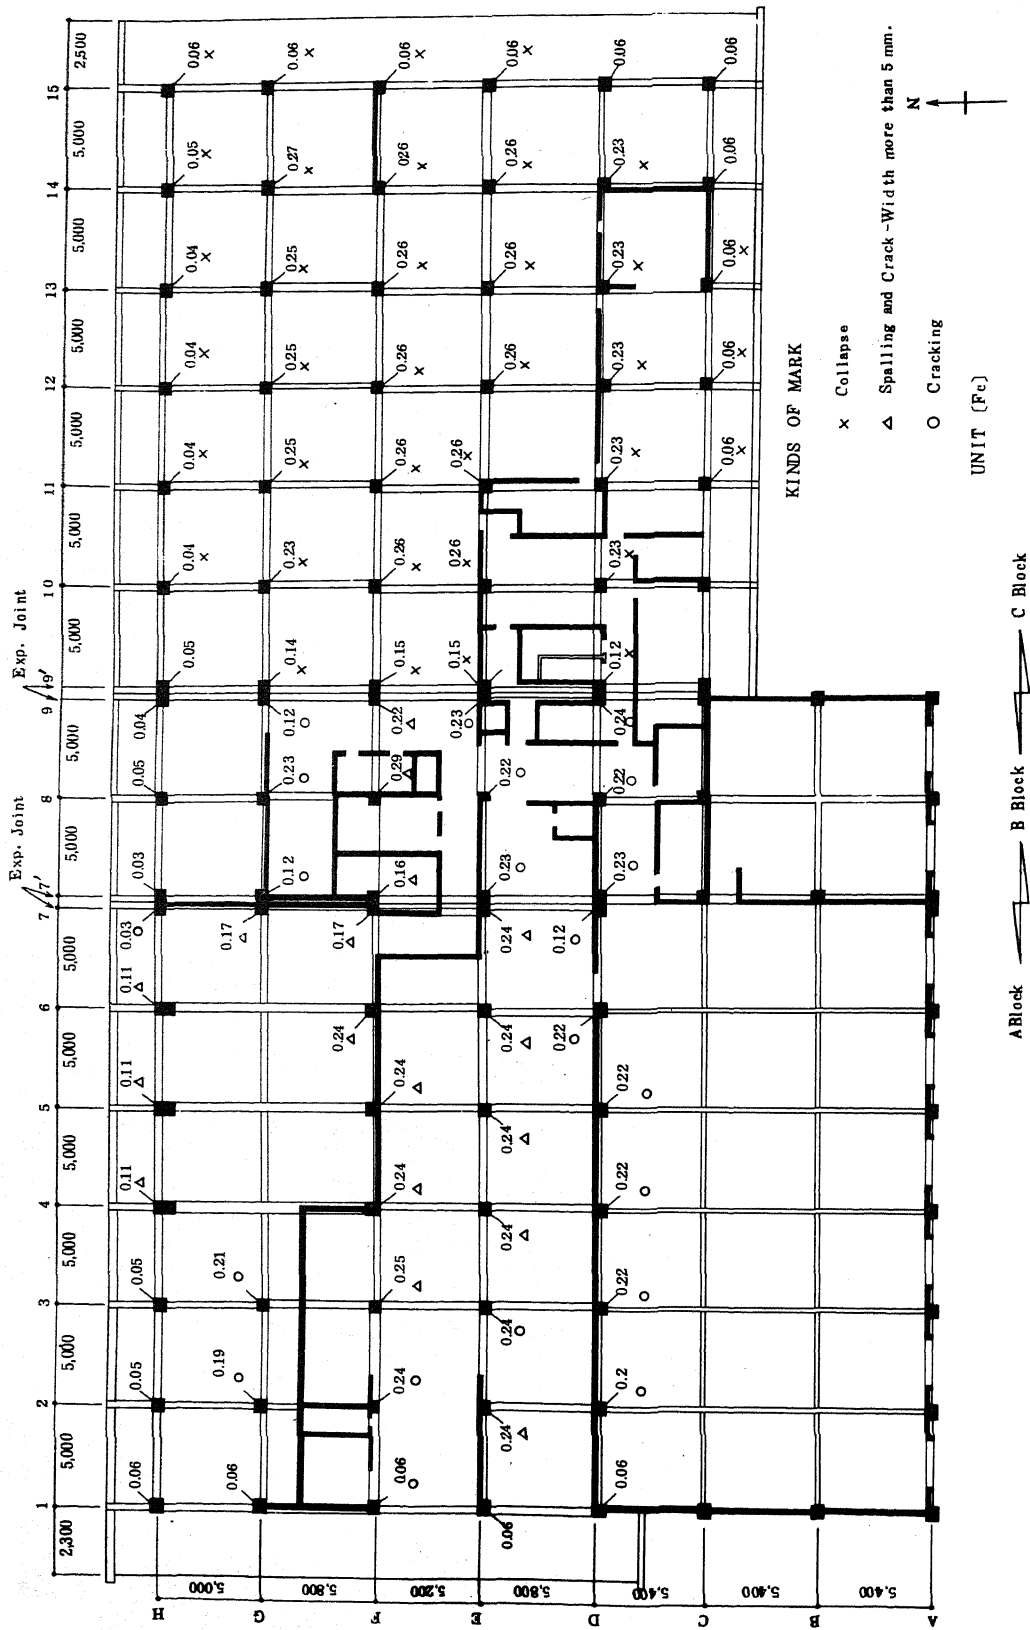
K.L. HOTEL FRAMING PLAN OF FIRSTSTORY AND DEGREE OF DAMAGED COLUMNS
